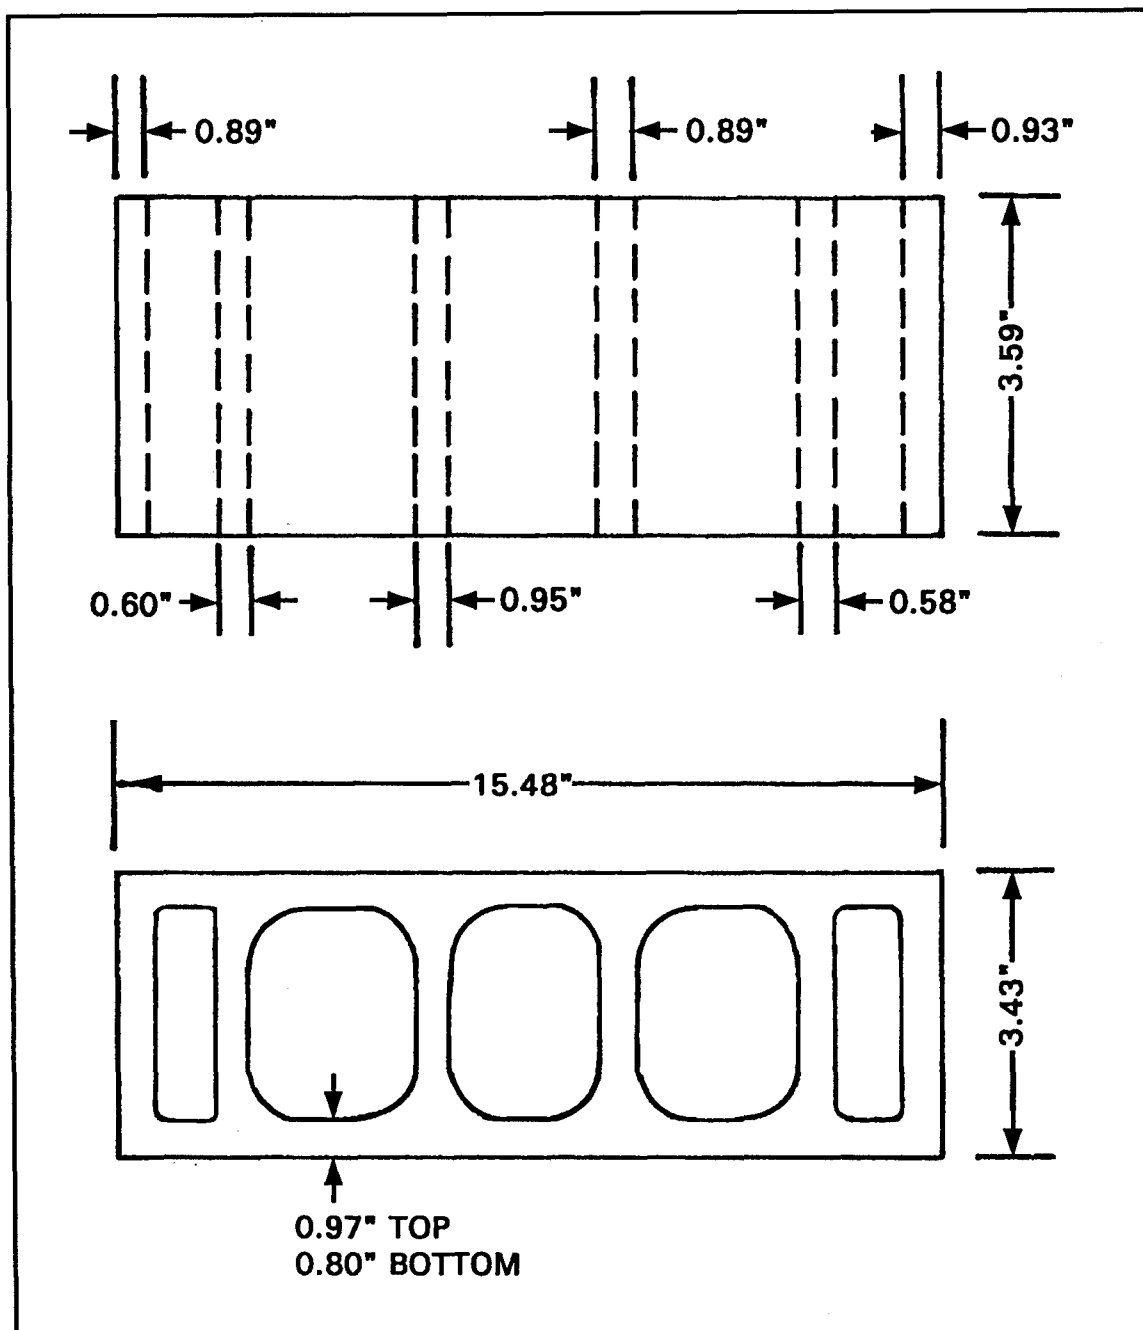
Typical elevation and cross section of 4-in. clay masonry units
